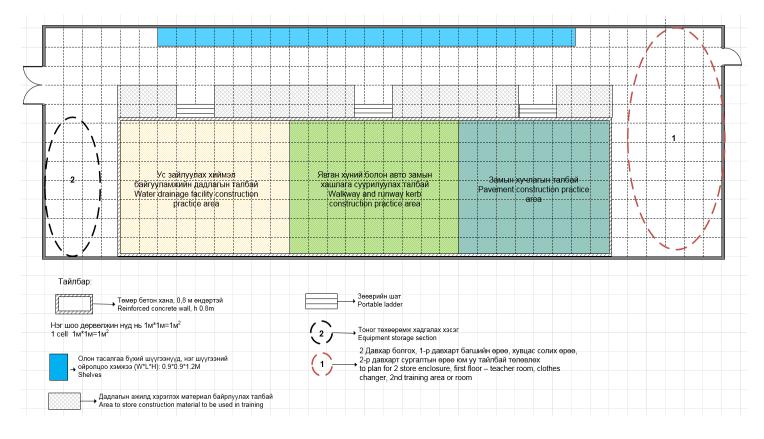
PRELIMINARY DETAIL – REPAIR WORKS - ROAD AND BRIDGE CONSTRUCTION WORKER SHOP, 36M X 12M (yellow highlighted section, height about 9 meters, the red dashed line circled area – to plan 2 story enclosure)
